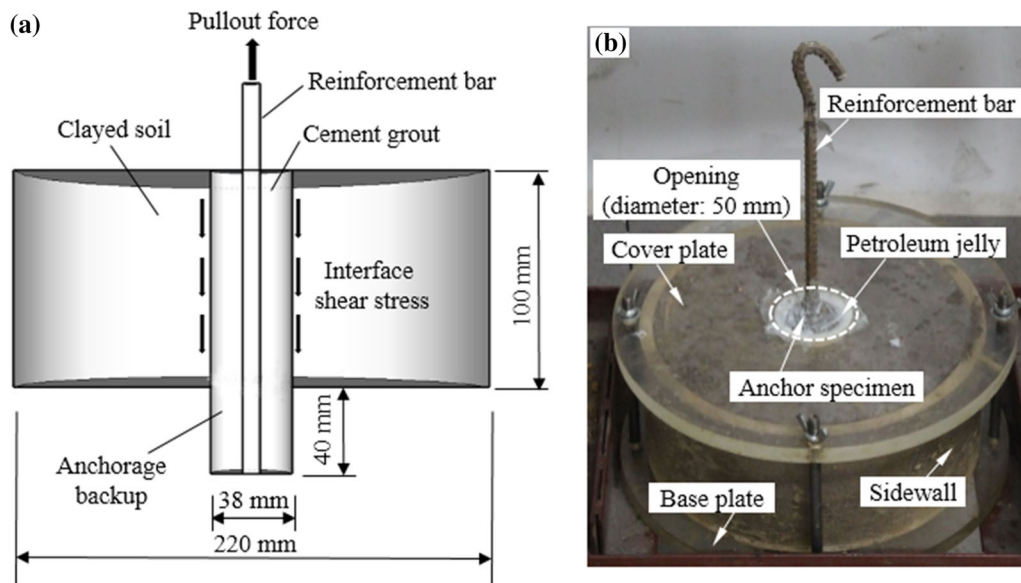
Element-grouted anchor specimen: a schematic of specimen with dimensions, b view of setup of the pullout cell with specimen ready for testing
